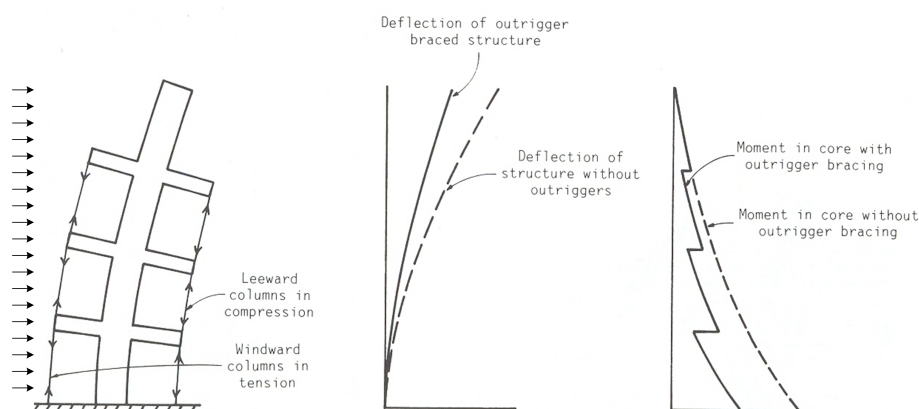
Behaviour of an outrigger-braced structure under lateral loading
